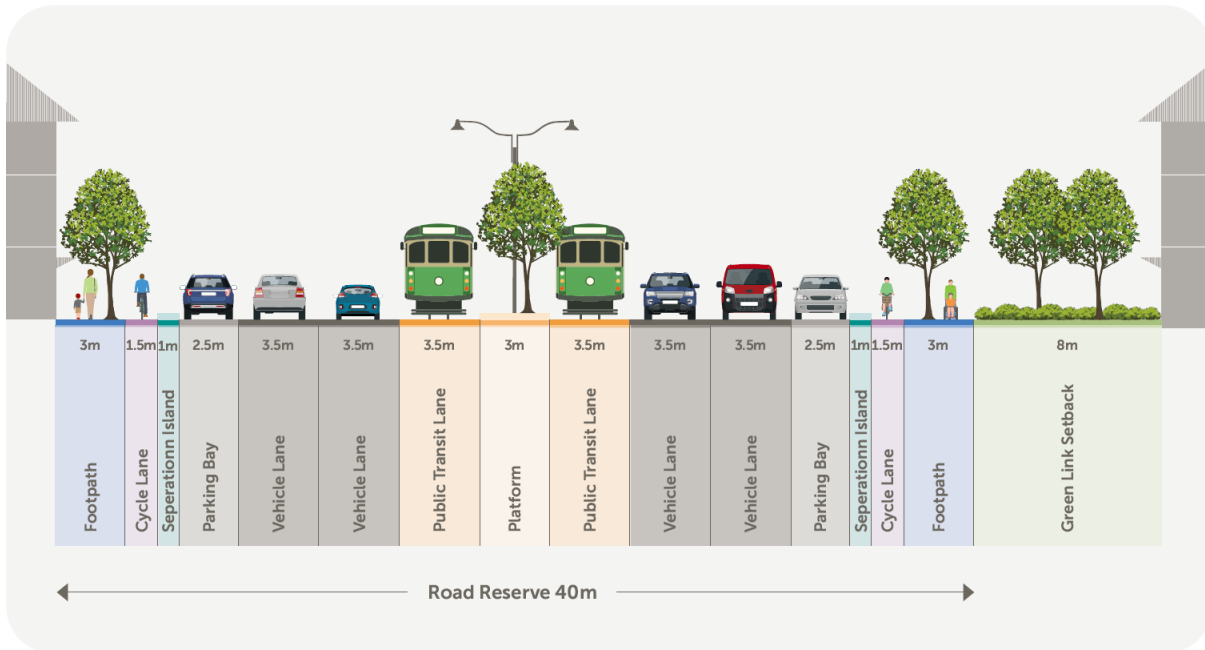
Indicative cross section - Pinjarra Road (40m Reserve)
